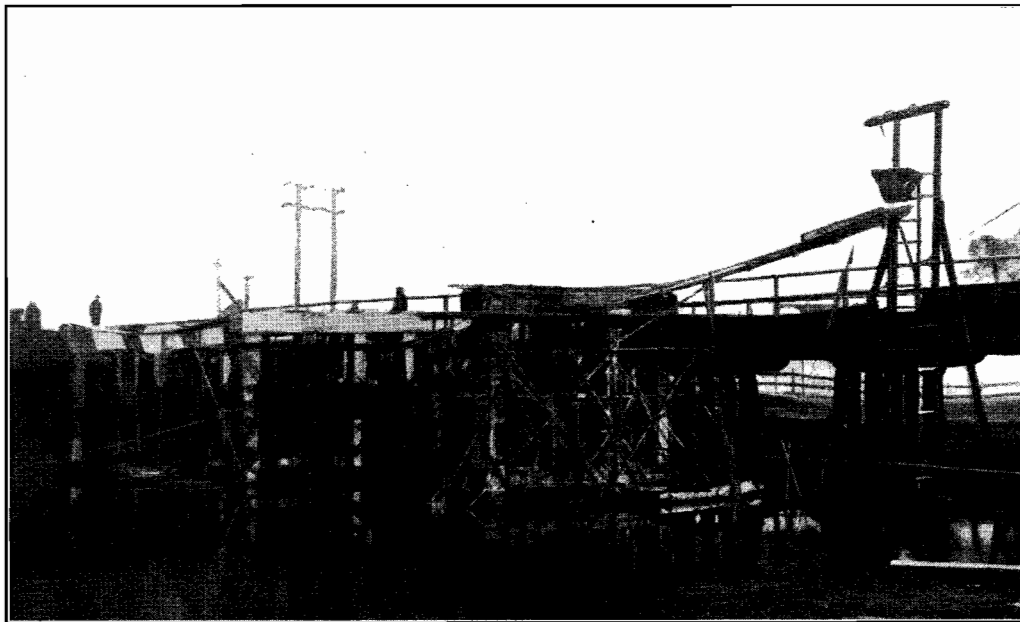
Hume Highway. New bridge in course of erection over the Murray River Flats near Wodonga.
